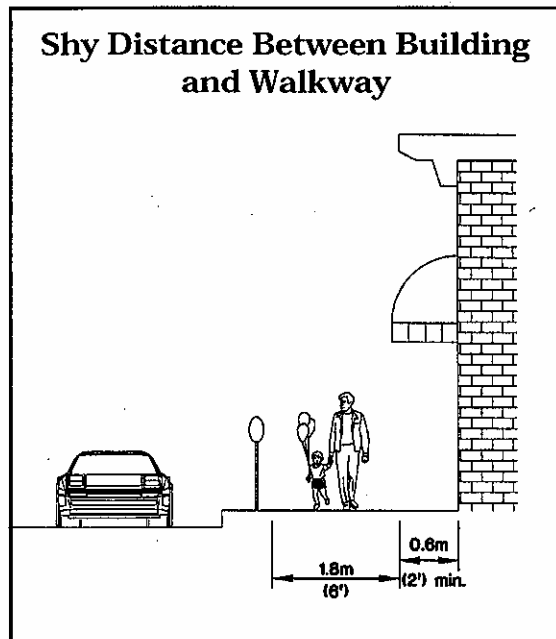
SHY DISTANCE BETWEEN BUILDING AND WALKWAY.
